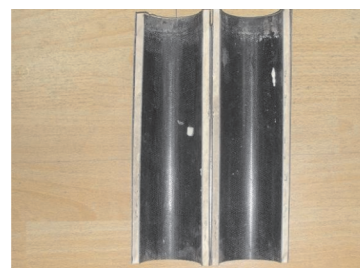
Shear crack at the end of the GFRP-foam sandwich pipe caused by the excessively tight steel hoop
